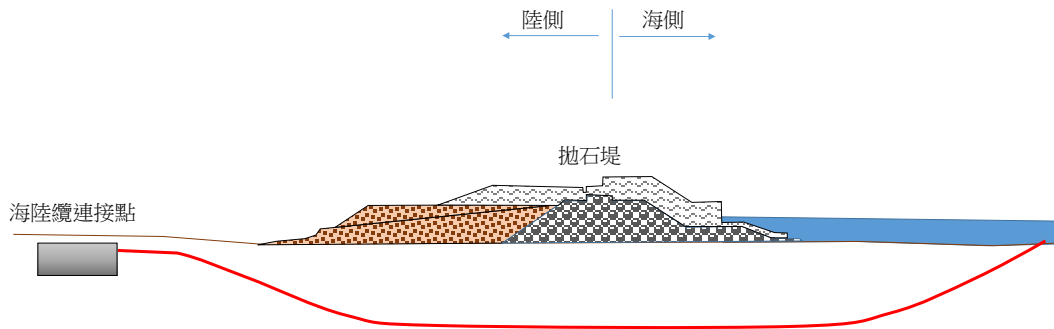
Concept of Landfall HDD's and Transition Joint Bays
